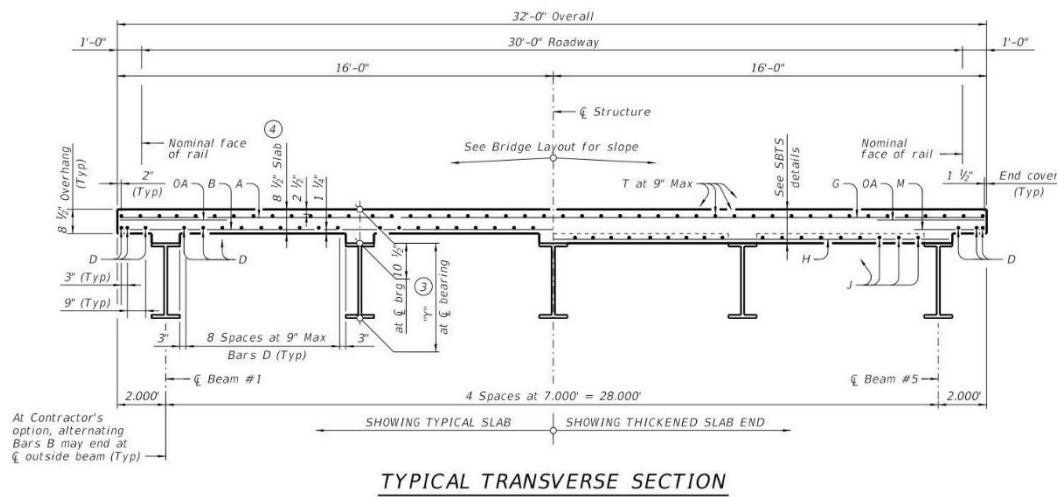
Typical Transverse Section (30' Roadway) from TxDOT Bridge Design Standard
